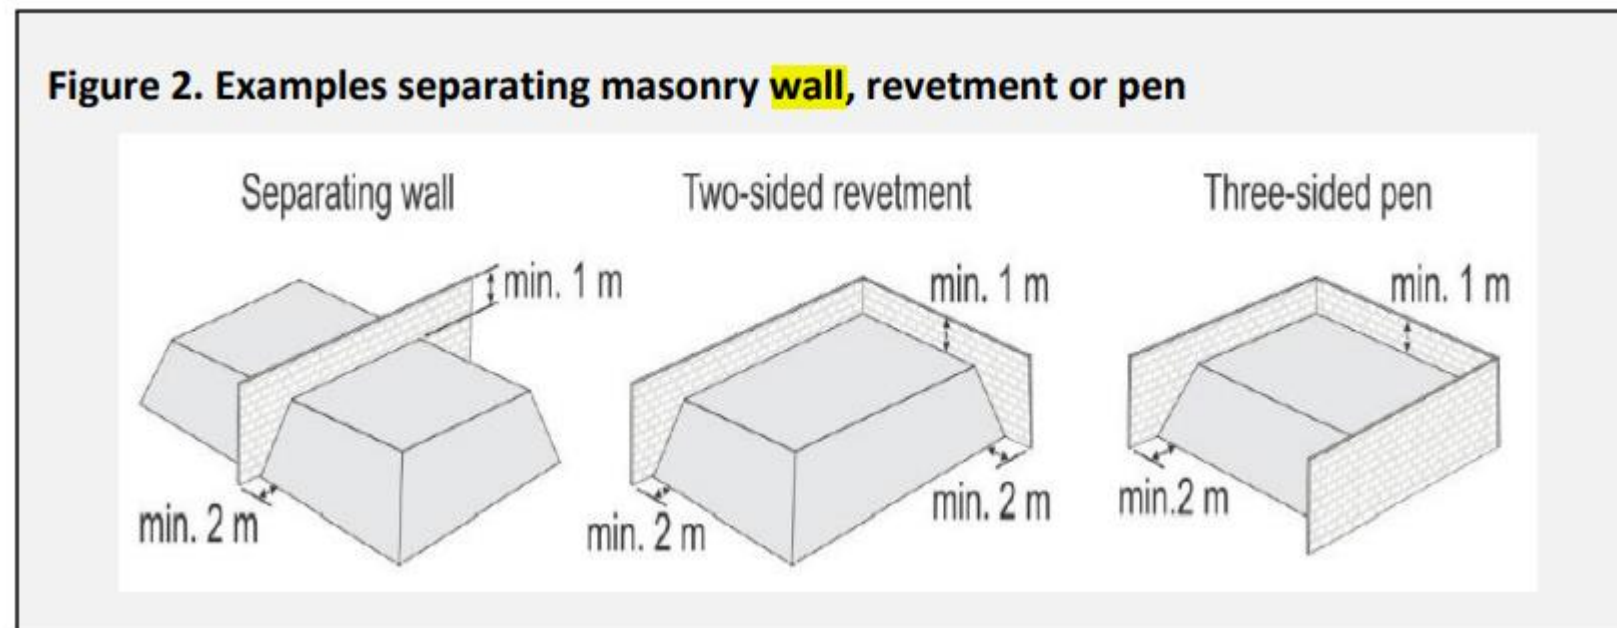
Examples of separating masonry wall, revetment or pen ([Guidance Note: GN04 Fire Prevention and Management in a Recycling Facility \(DFES 2020\)](#))
